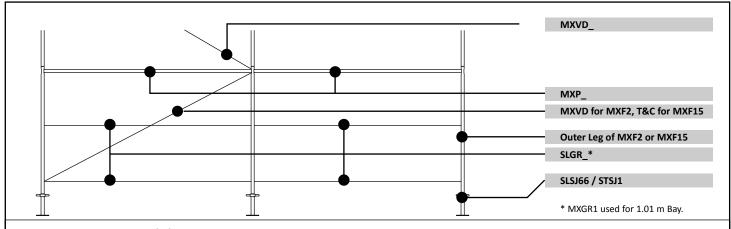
Bracing First Lift for MXF2 or MXF15 (Elevation View of Outside Frame Leg)
